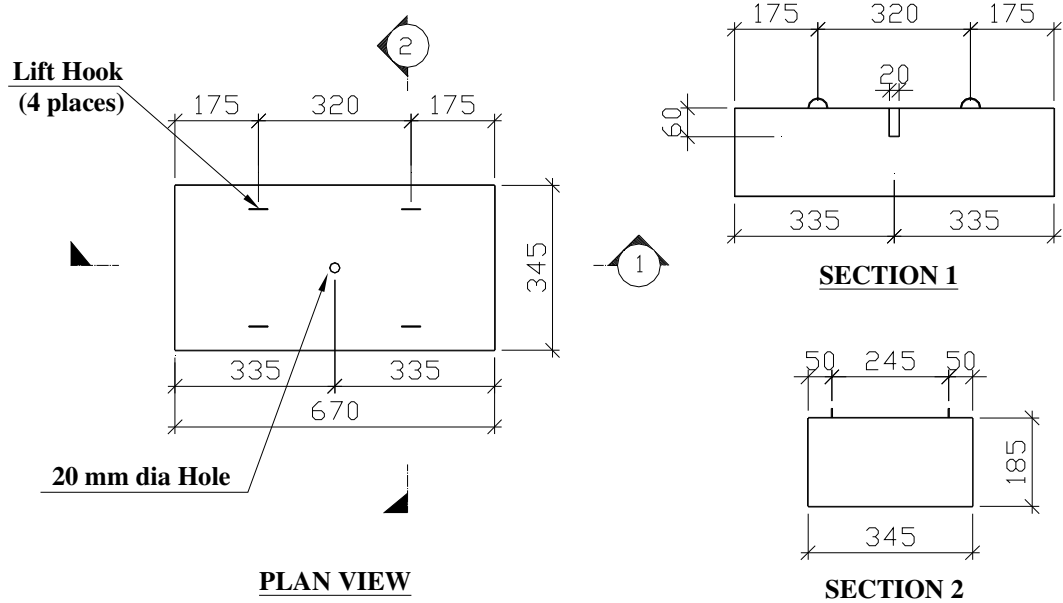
Details of the supporting concrete base (dimensions in mm).
